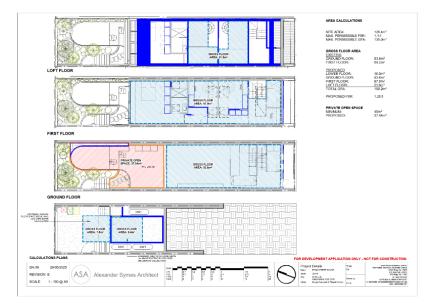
Calculations plan of the proposed development outlining the proposed FSR per floor level as well as the Private open space provision as requested by council.
